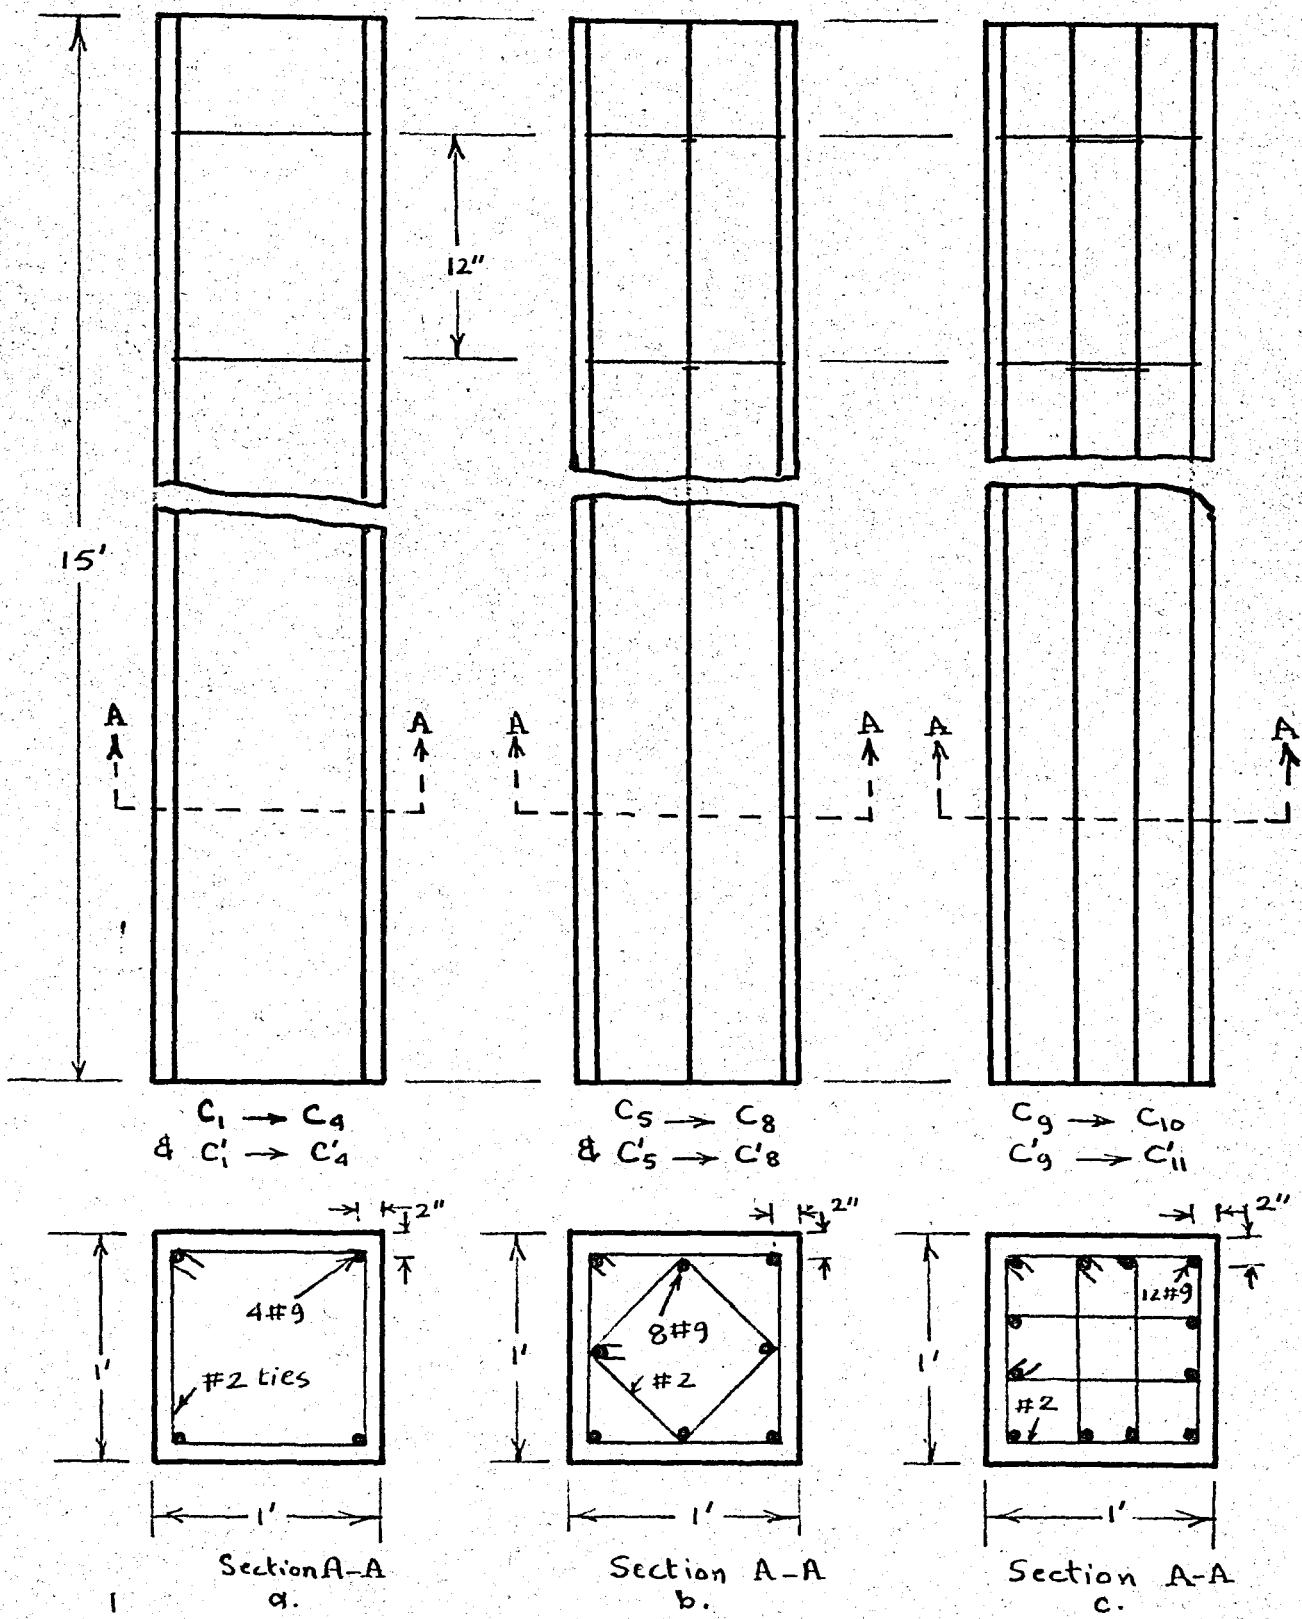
Stairway Columns - Steel Reinforcement. (Scale 1'=3cm)
